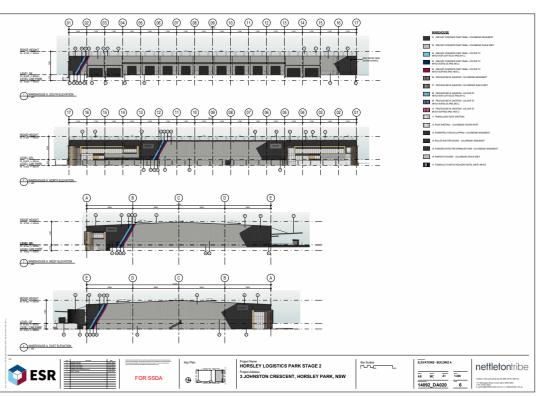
Warehouse Elevations - Building A (Source: Nettletontribe)
